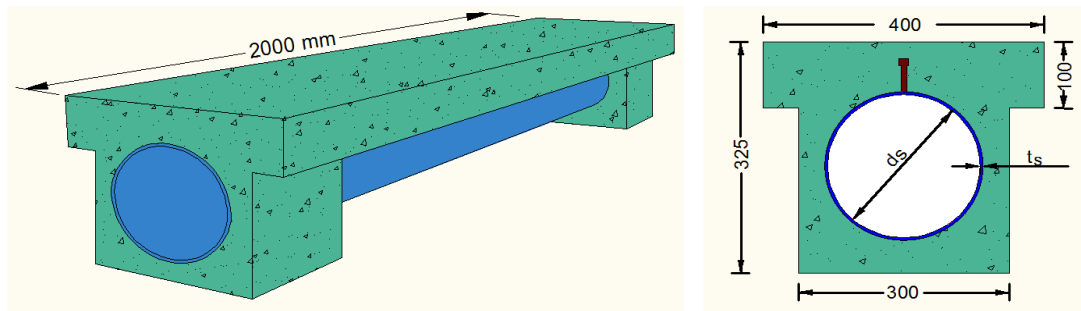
Typical shape and dimension of composite steel tube concrete beam specimen.
